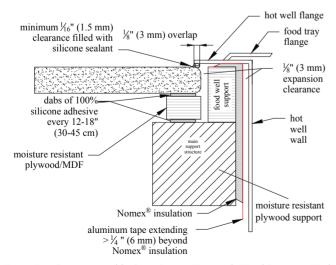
Cutout Assembly Cross Section View with Wood Support - High-Strength Corner
